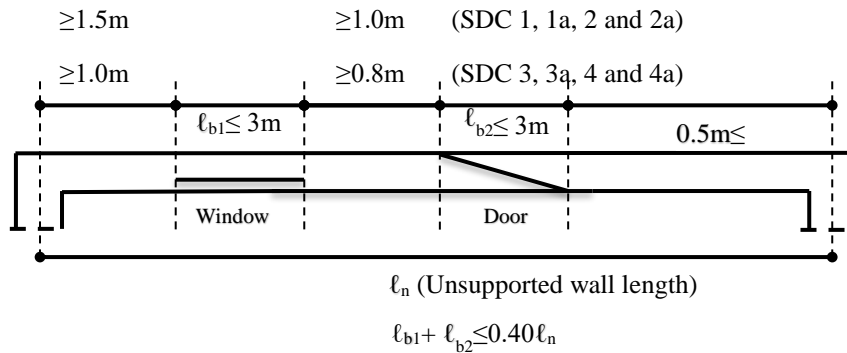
Boundary Conditions for Openings in Masonry Walls
